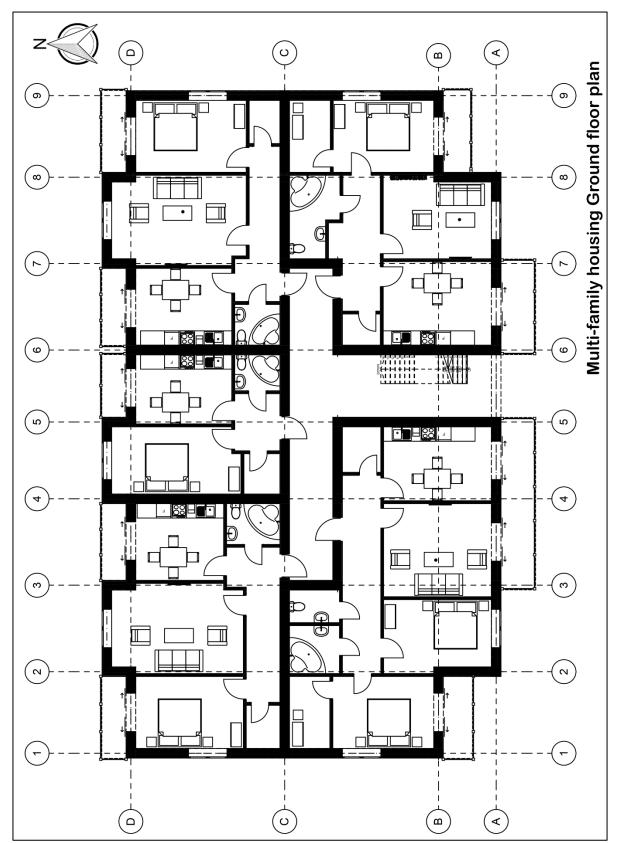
Ground floor plan created using ArchiCAD 22 software. Source: (By Author)
